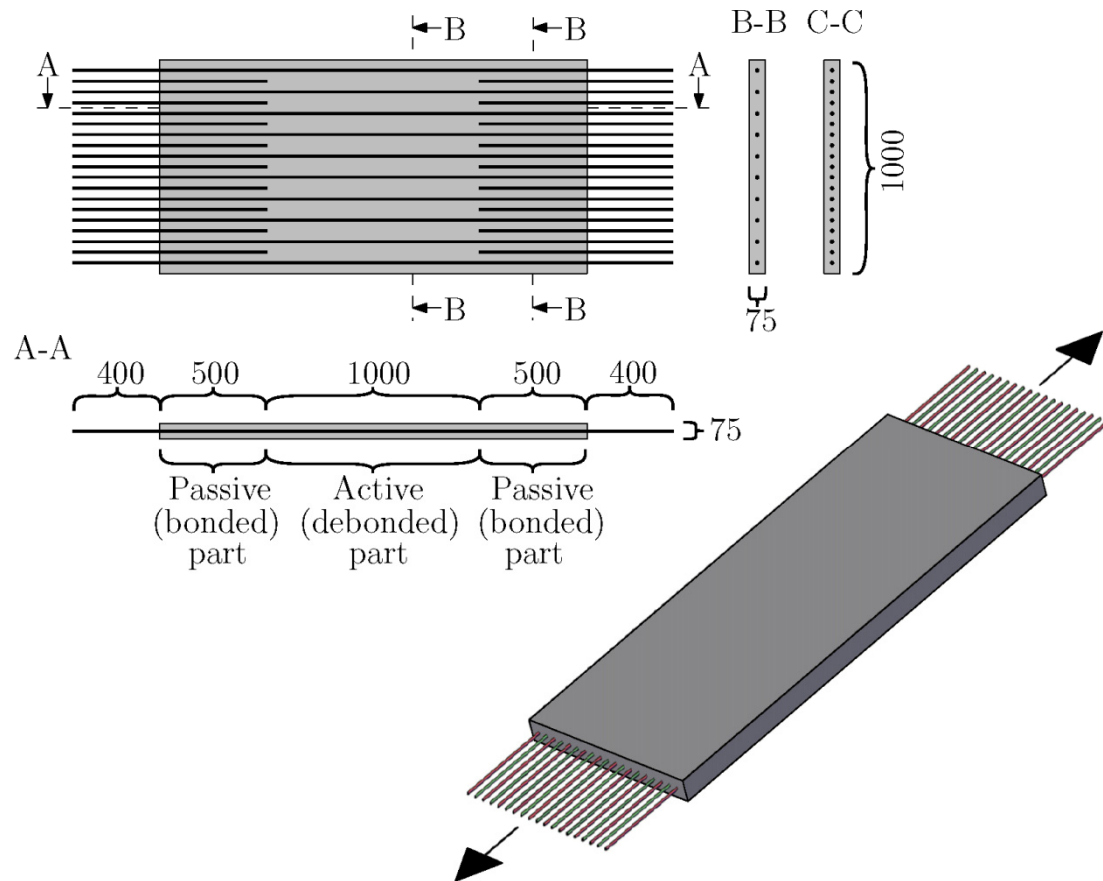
Geometry and example of primary and secondary reinforcement layout for LS1. Section A-A shows a GFRP rebar throughout the length of the element. Section B-B shows the cross-section of the de-bonded zone reinforced with GFRP. Section C-C shows the cross-section of the transition zone with primary and secondary reinforcement. Dimensions are given in mm.
